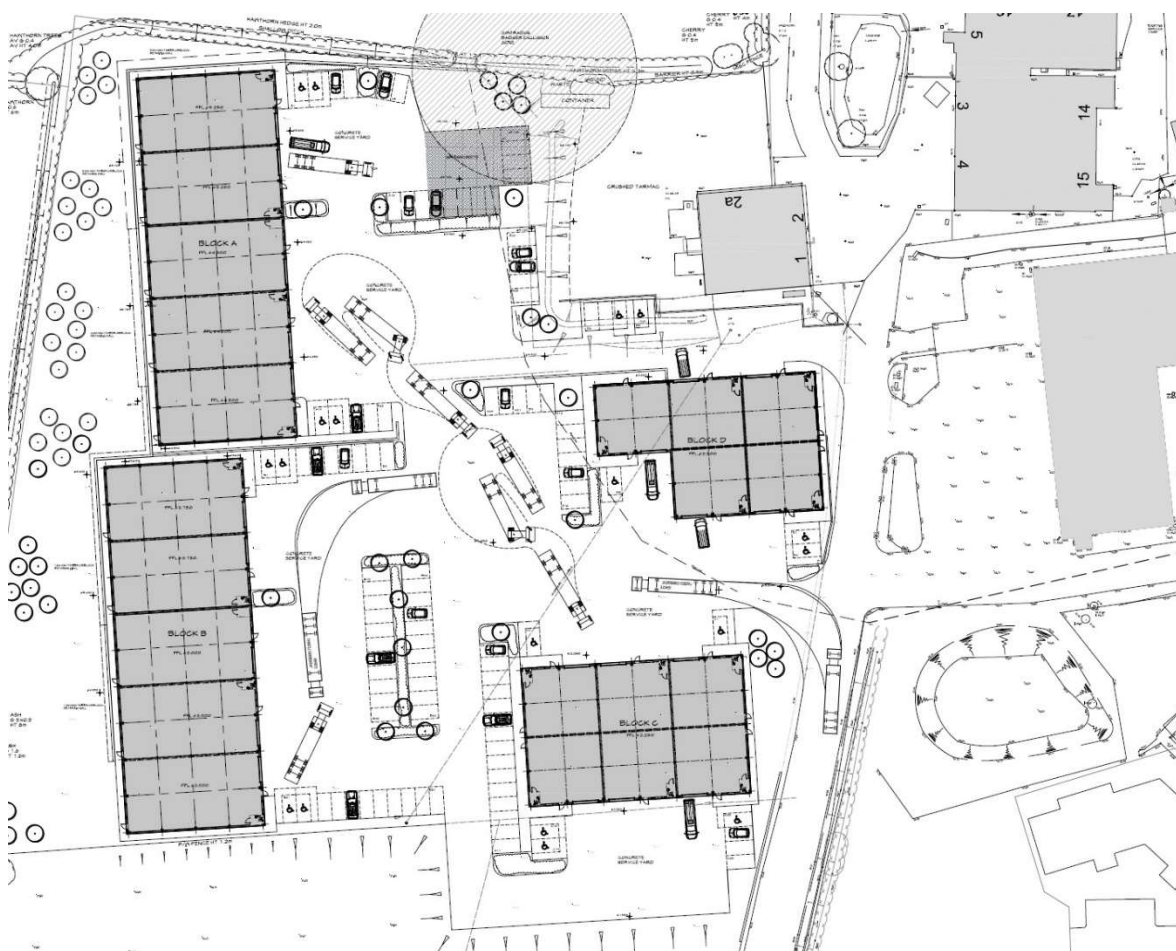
Plan of north-eastern section of proposed development with badger buffer zone (shaded area). Provided by client
